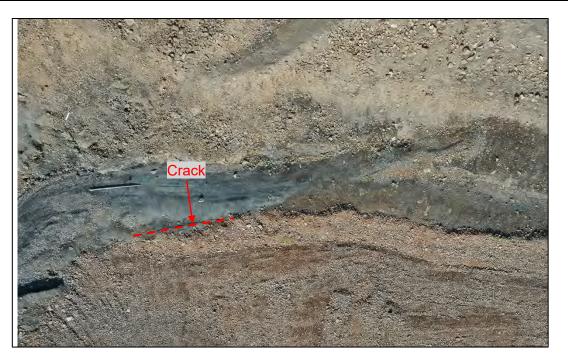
West Open Pit – Crack behind remnant highwall, as seen from above.
